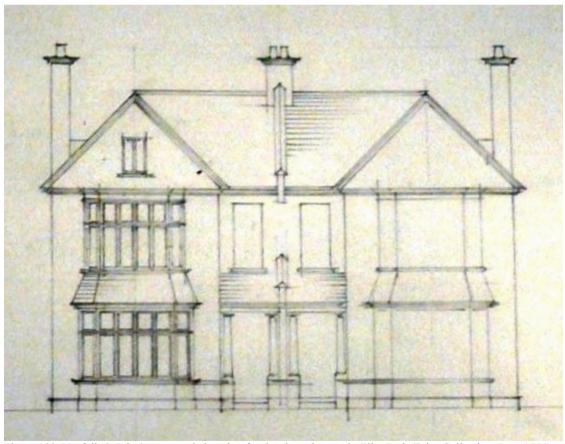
Norfolk & Prior's proposed elevation for the above houses in Eliot Park (Prior Collection, Item 1555)
